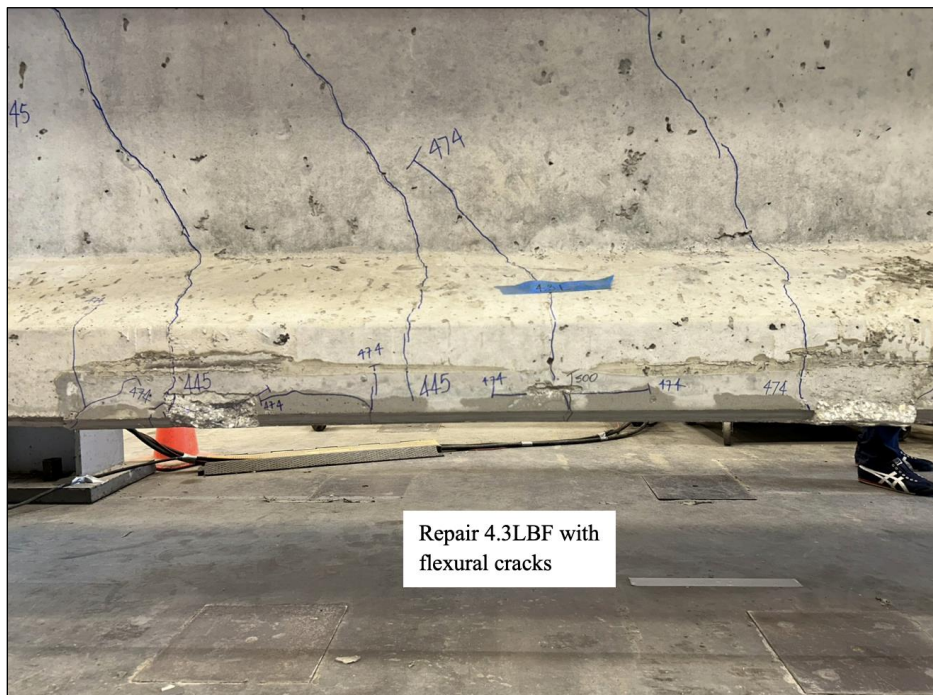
Photo. Test 4.2.S (repair 4.2RBZ, 4.2RTFE, 4.2RTF, 4.2LTF) flexural cracks on repair 4.3LBF at 500 kip. Cracks on the perimeter of the repair formed on the ends and midspan of the repair (left face of girder pictured).
